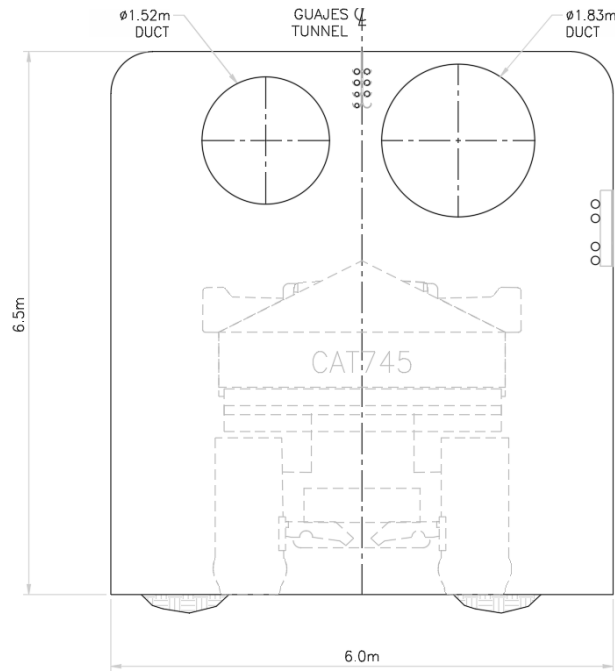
Media Luna Guajes Tunnel Cross-Section (Development Phase)
